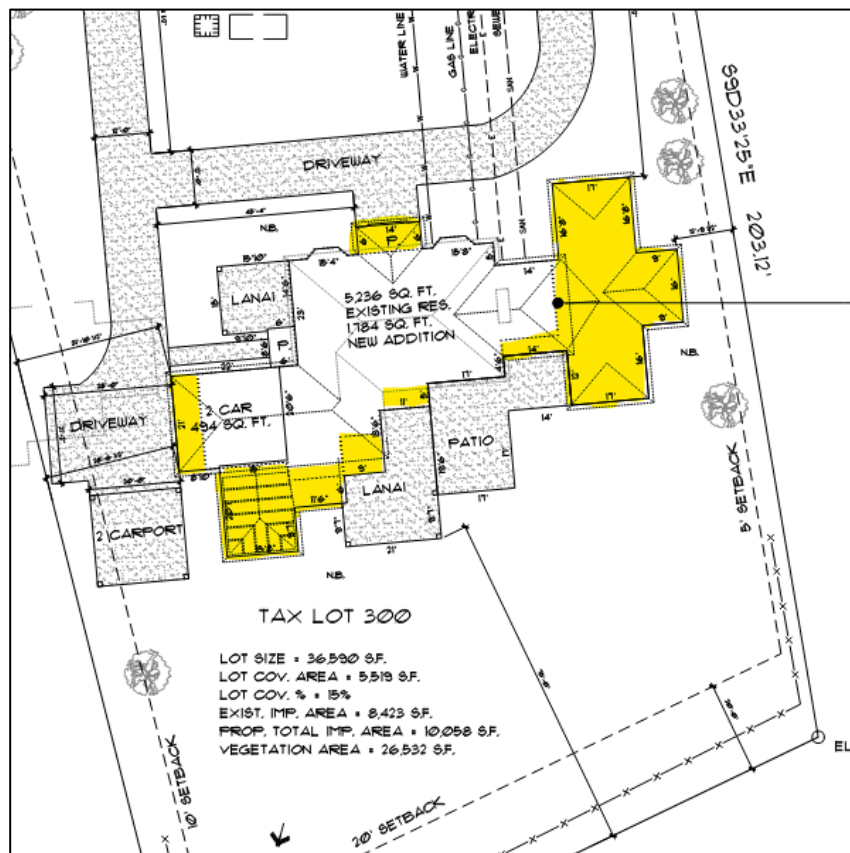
Site plan showing location of proposed footprint expansion (highlighted). Expansion also includes the addition of two lanais (not highlighted).
